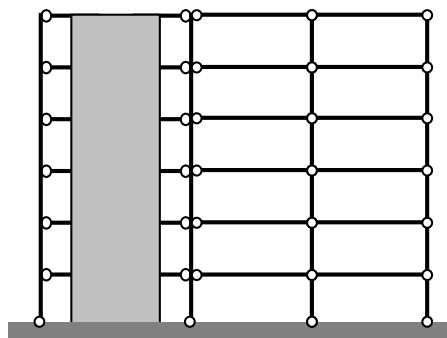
Example of innovative hybrid coupled shear wall system connected to a gravity-resisting steel frame with pinned beam-to-column joints.
